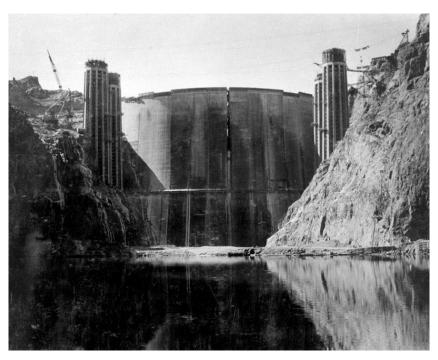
Hoover Dam intake towers and top of cofferdam.
